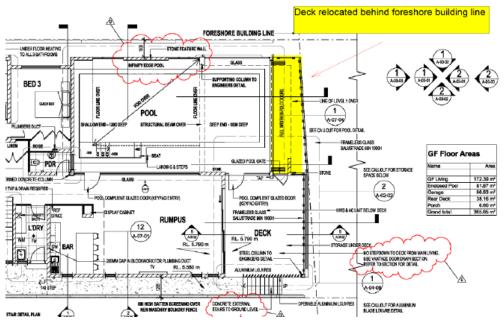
Amended plans depicting relocation of deck behind foreshore building line
